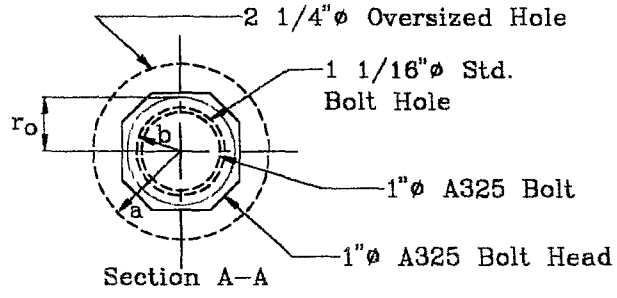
Undeformed Clamping Bolt Section (Bolt Not Tightened)
